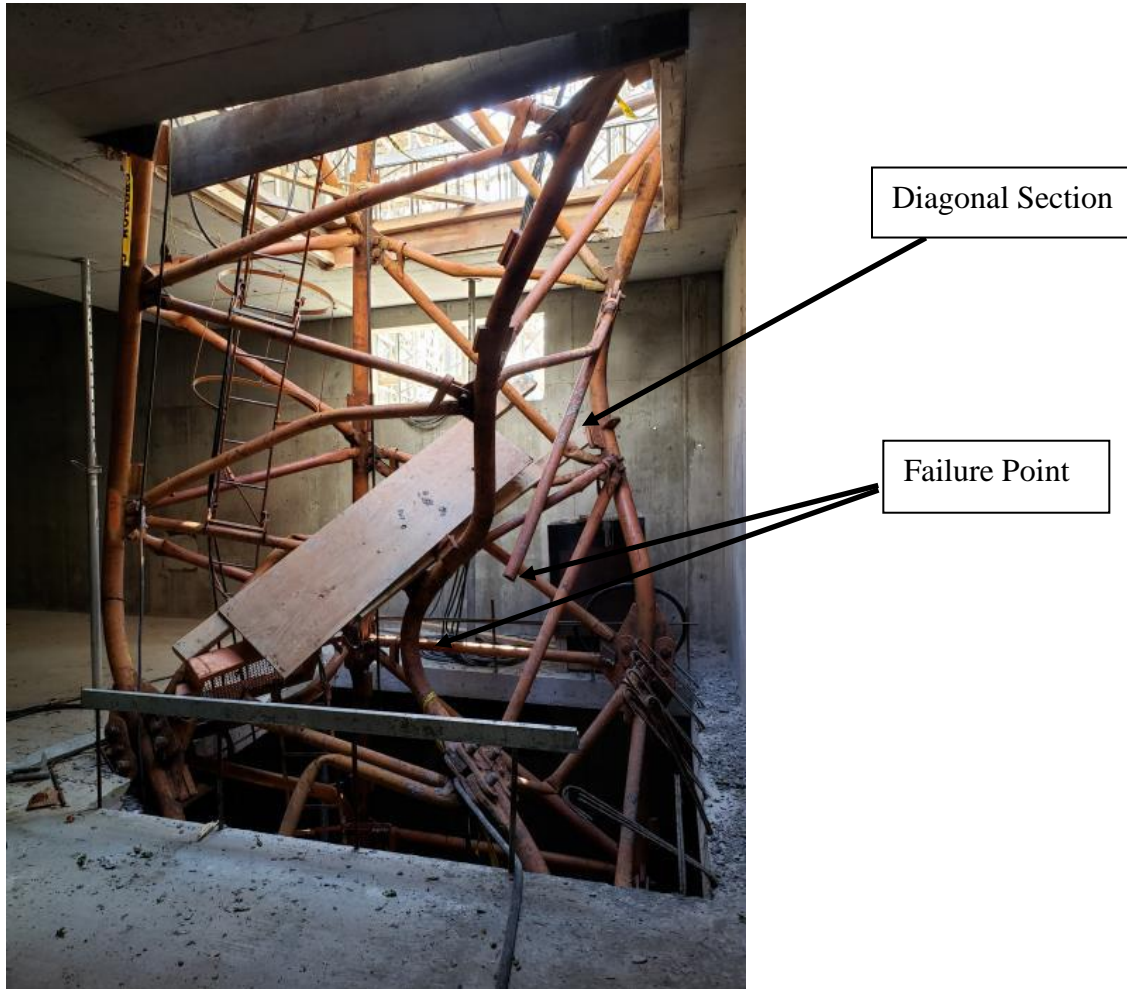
Crane section after collapse. Highlighting the diagonal section and failure point. Credit: NS Department of Labour and Advanced Education
